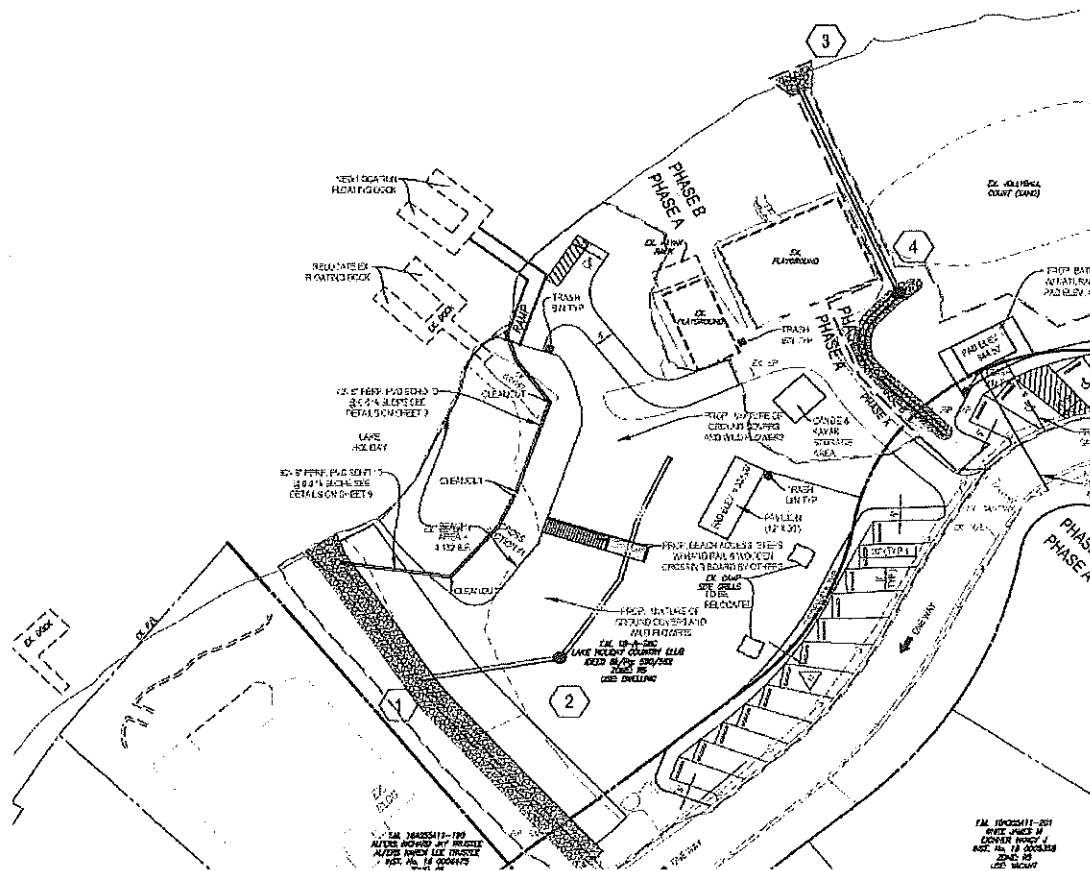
Greenway Engineering Site Plan for proposed Beach II Improvements – Phase One
